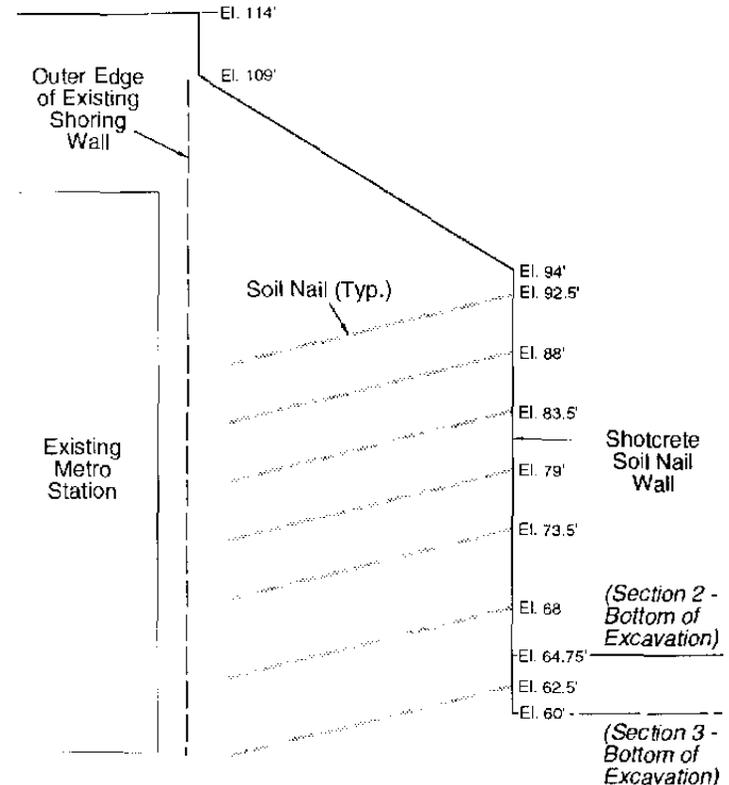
Soil Nail Wall Sections 2 and 3 for Shallow and Deep Excavations at Station
